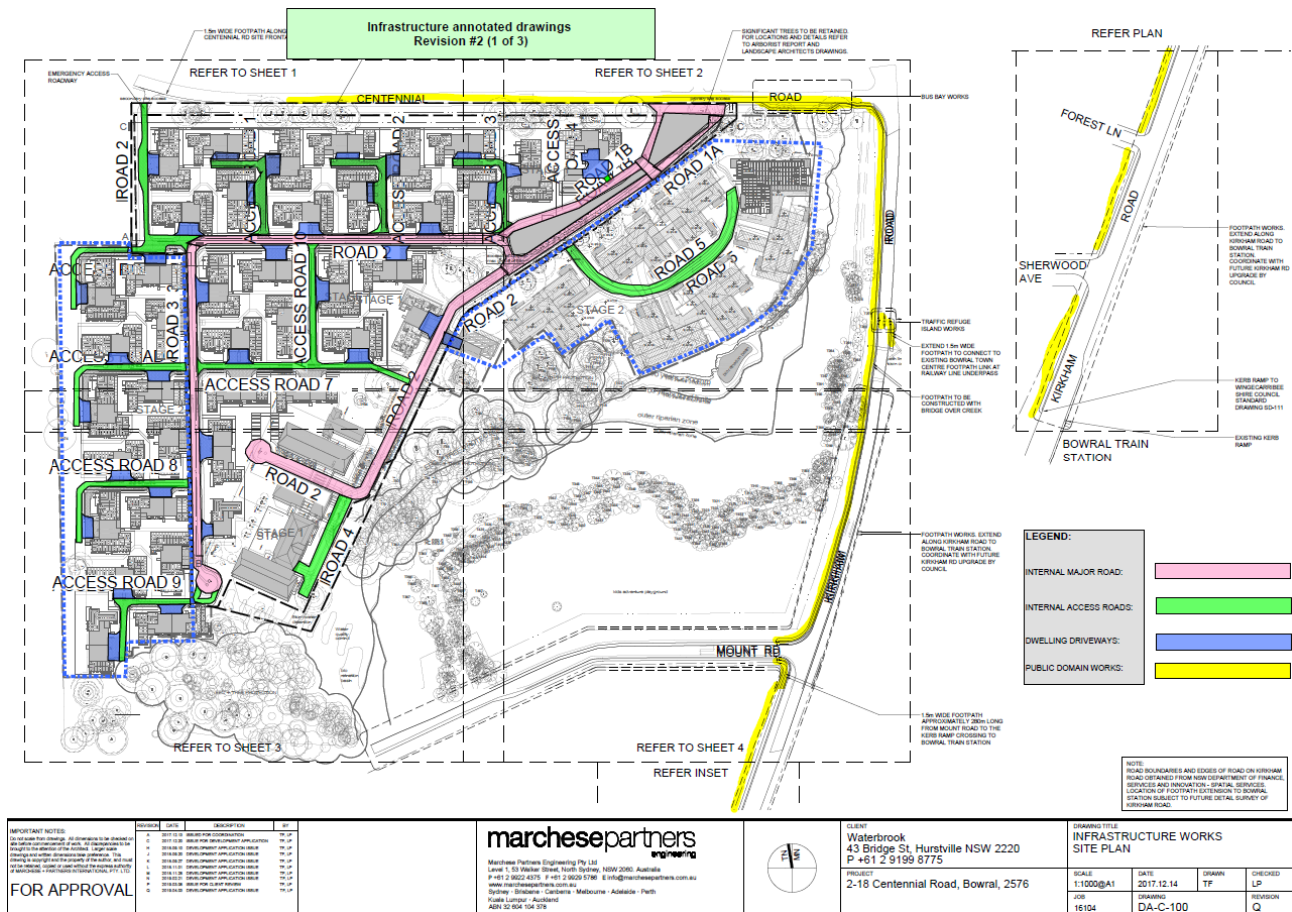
Extract from Site Infrastructure Works plan showing internal road hierarchy
